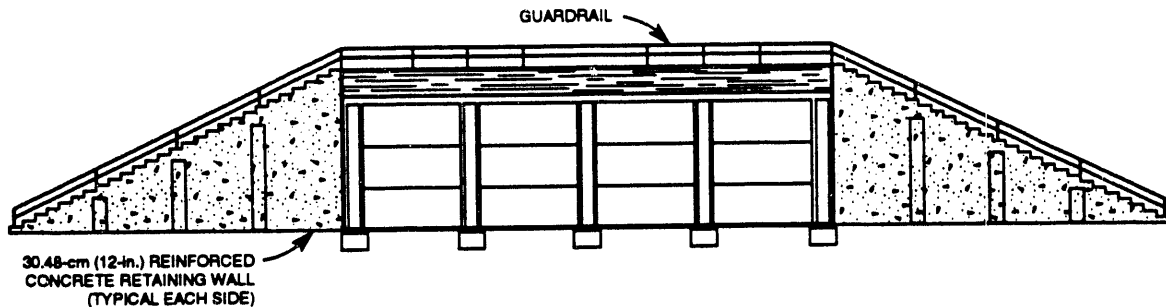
Front elevation view of a typical remote-handled transuranic storage bunker (Building 7883).
